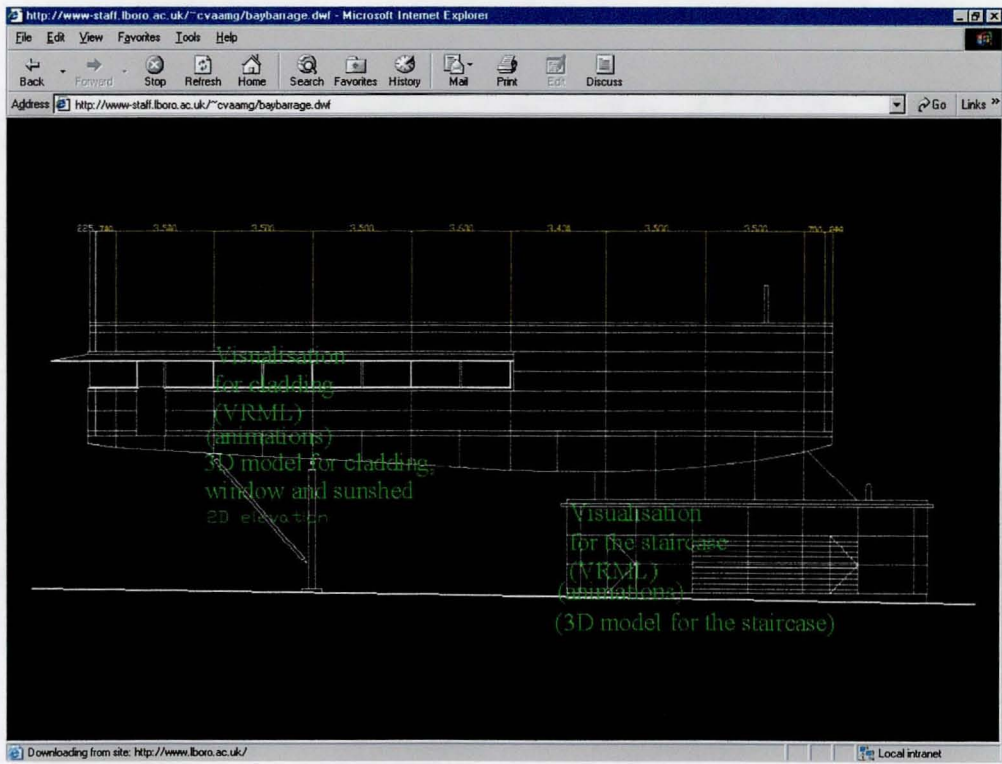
2D elevation drawing for the Bay Barrage Building with hyperlinks to the created visualisations
